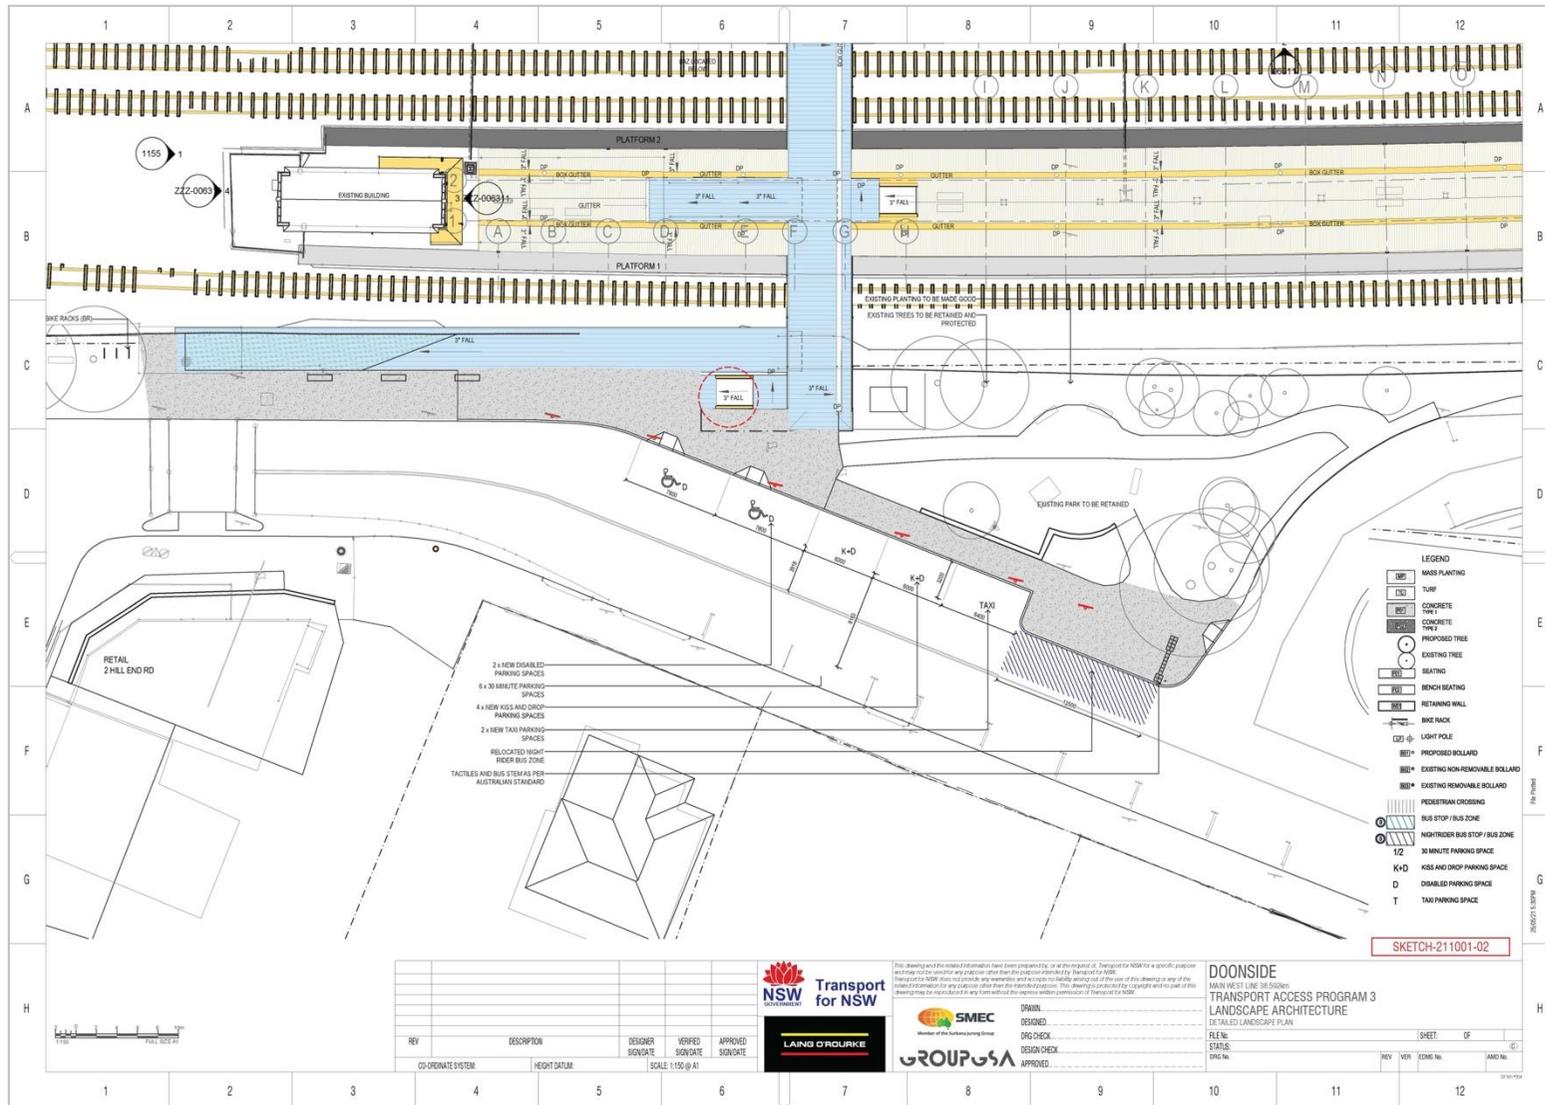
Concept Landscape Plan – northern side of station<sup>5</sup>
